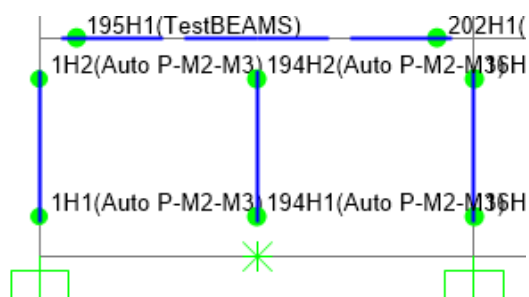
Detail of the reinforced concrete shear wall modeling, showing the subdivision of the beams in three elements: two parts of existing beam on the sides, one part of extremely stiff beam in the center, corresponding to the wall.
